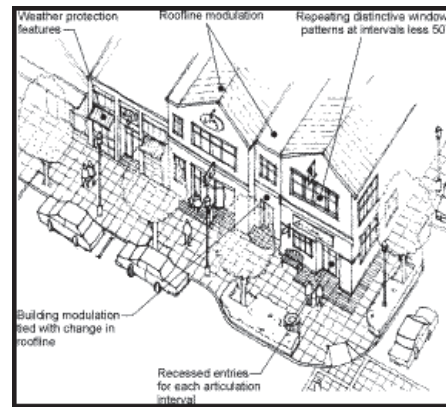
These buildings illustrate a combination of horizontal building modulation, roofline modulation, and building articulation to reduce the architectural scale and provide visual interest.
